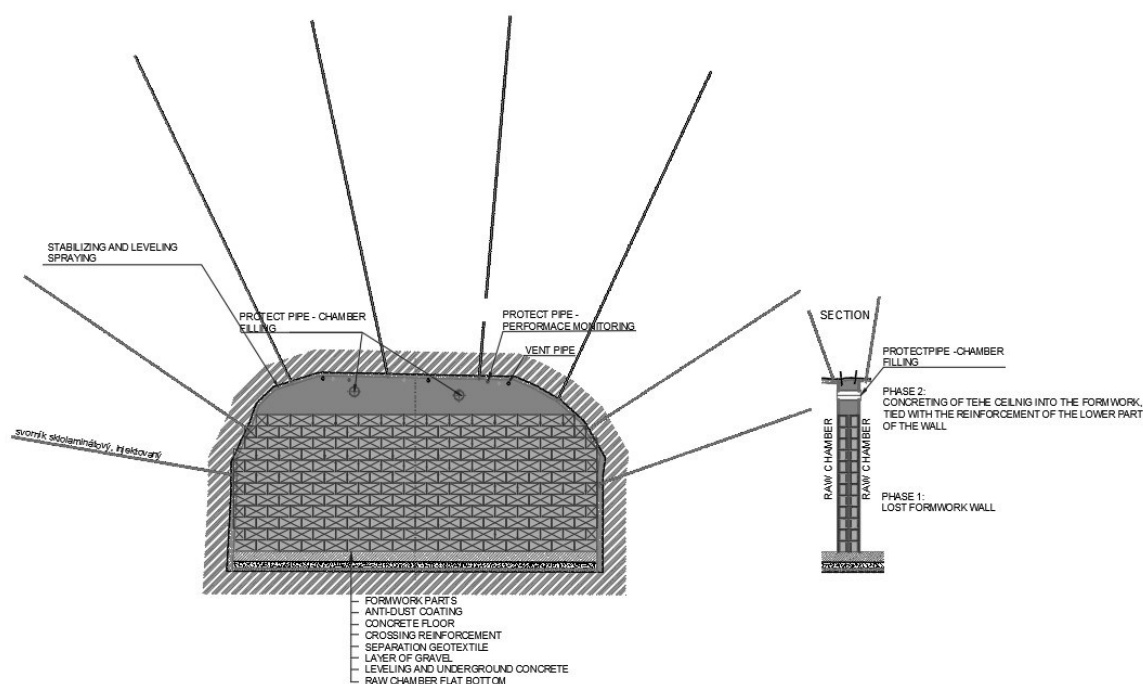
Separation of a segment - reinforced concrete partition wall (lost formwork).
